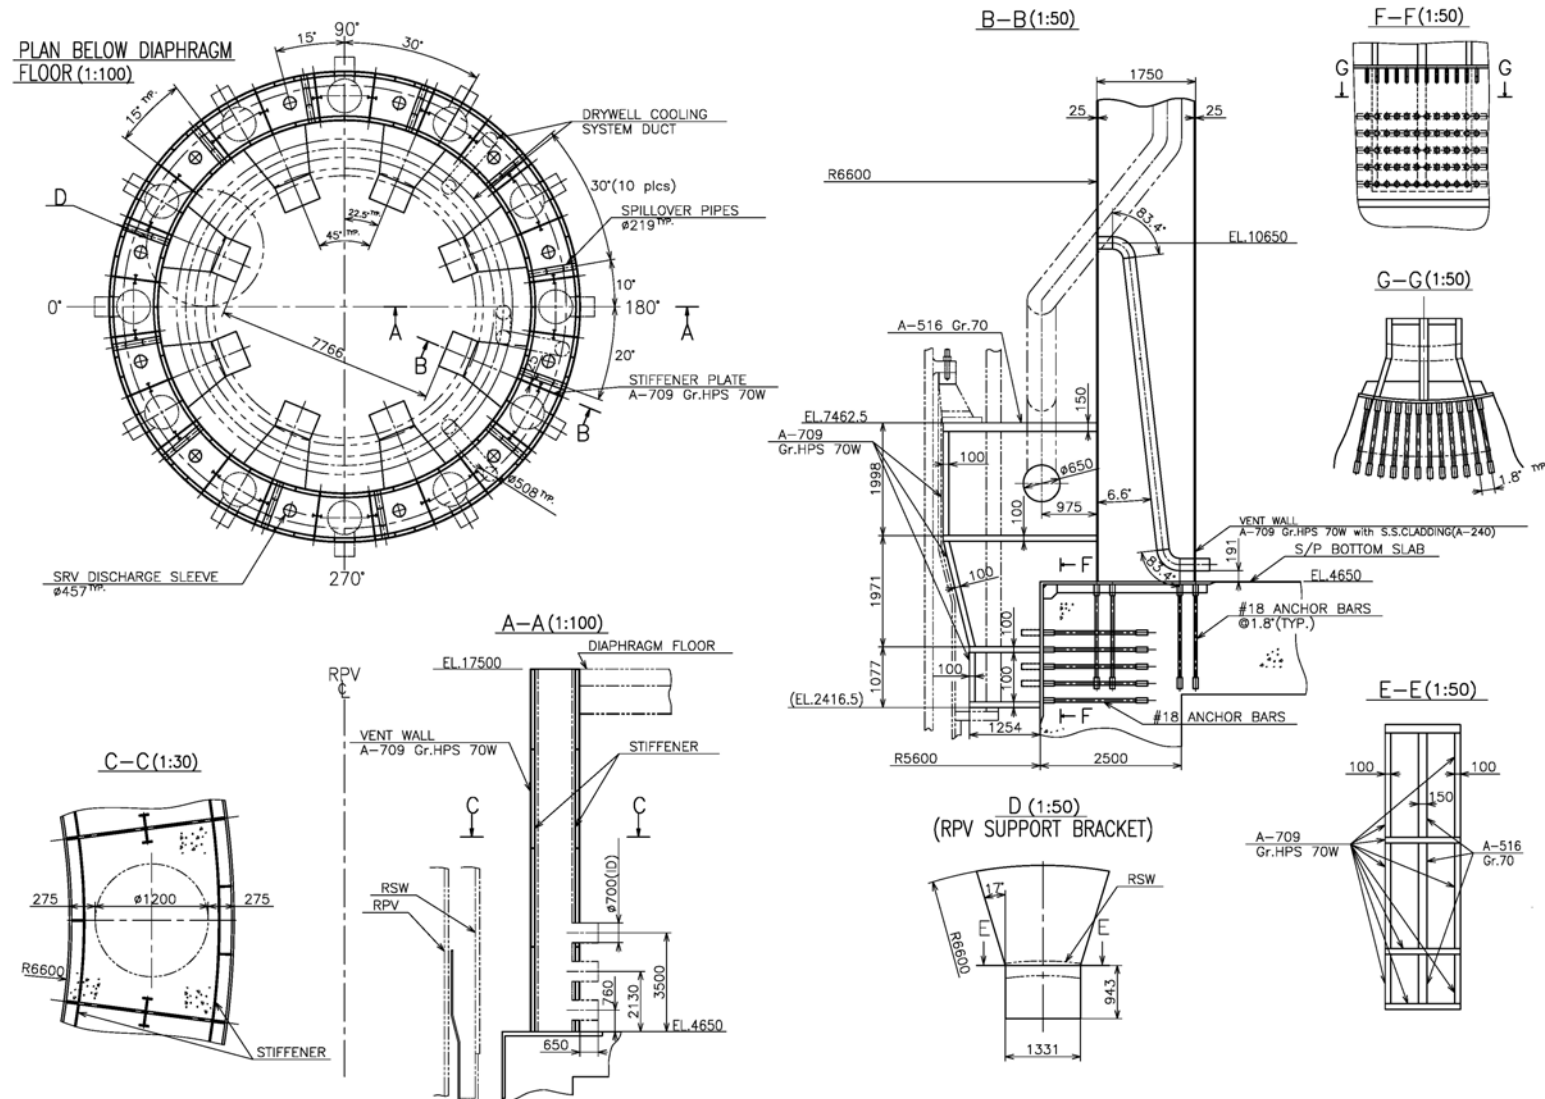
G.1-57. RPV Support Bracket &amp; Vent Wall
